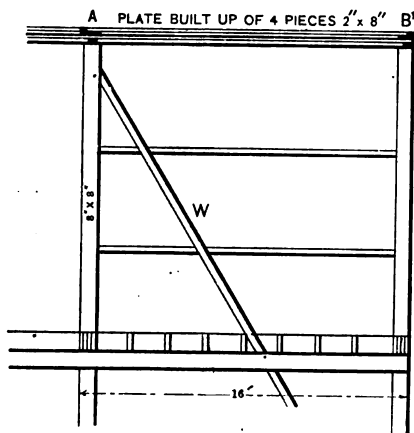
Elevation at Eave.—Scale, $\frac{1}{4}$ Inch to the Foot.
